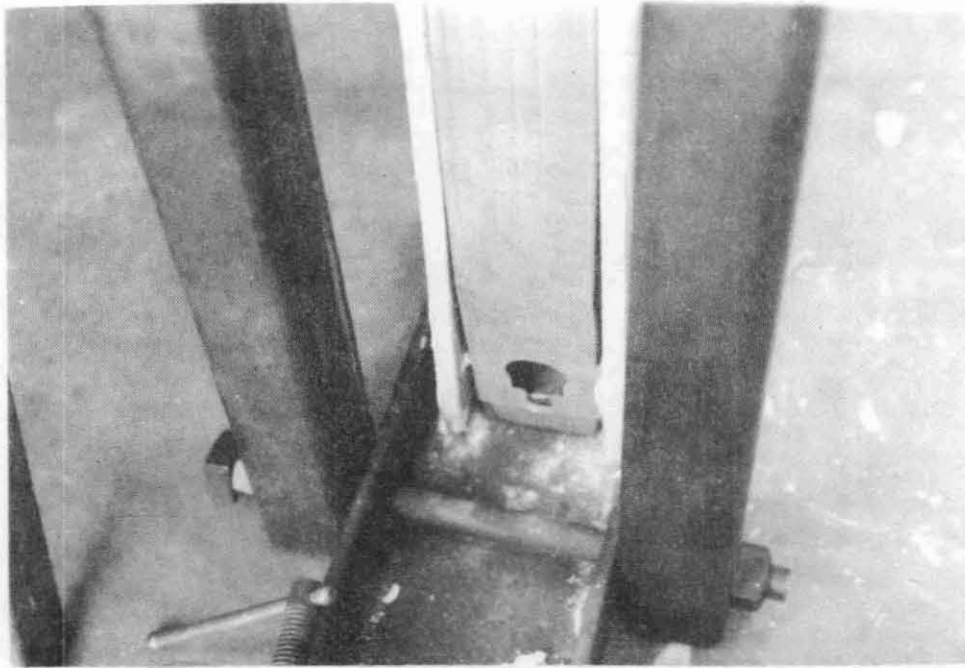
Partition Test Specimen P2A: Typical Failure at End Stud
